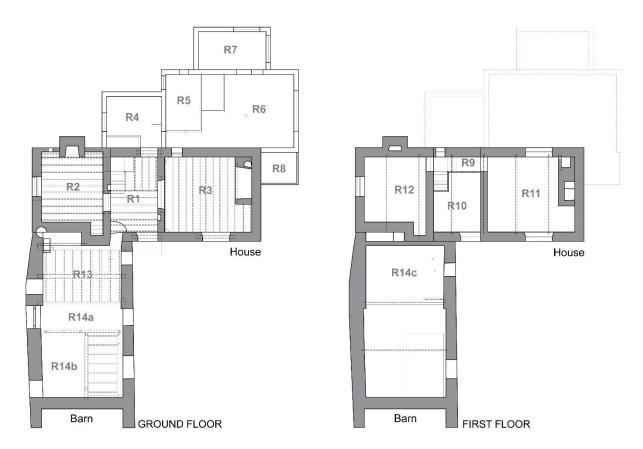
GROUND- AND FIRST-FLOOR PLANS (MEASURED PLANS PRODUCED BY THE CLIENT).
